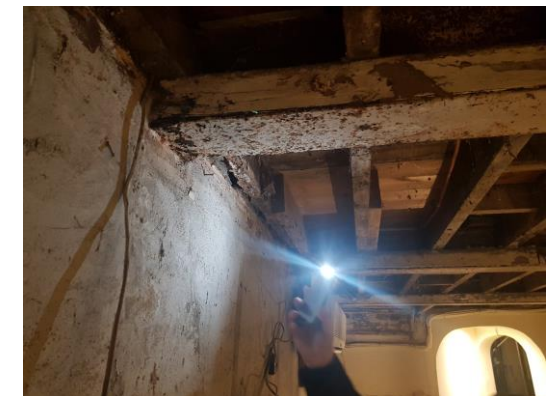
Corroded beams at ground floor adjacent to Party Wall – note delamination of bottom flange
